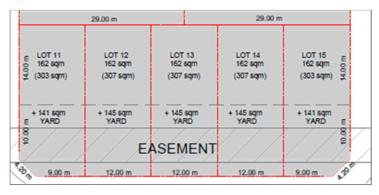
Indicative subdivision plan illustrates a 10m front setback of lots proposed to be an easement to provide for the sewer alignment.
